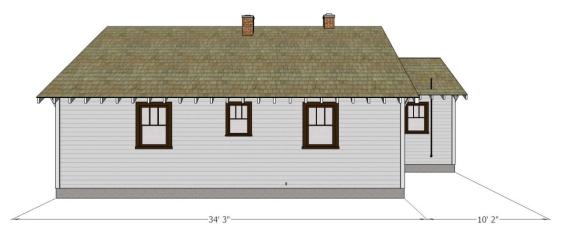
Measured drawing of west elevation of Ranger Dwelling.
